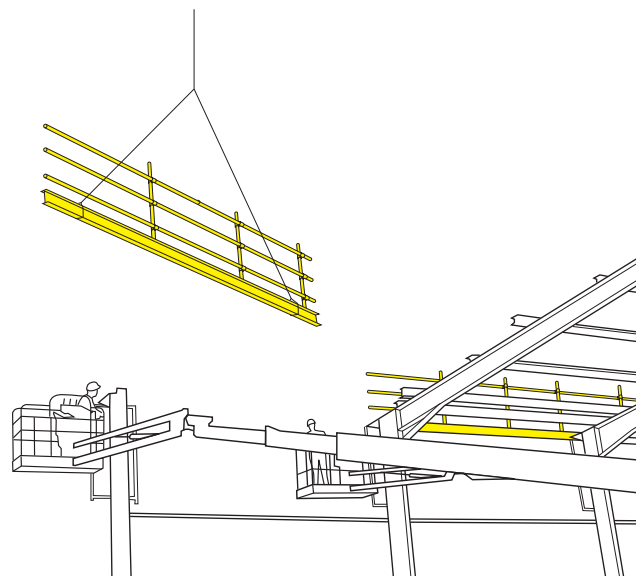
Pre-assembled guardrails – fixed to structural steelwork ('I' beams) prior to craning into position.
